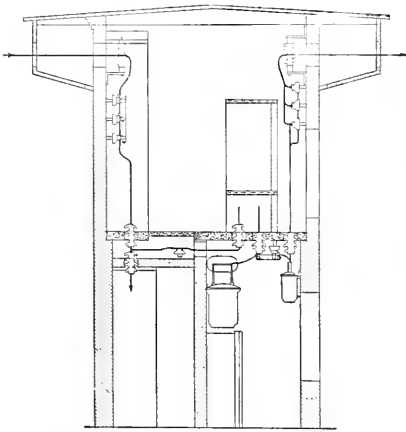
ELEVATION OF APPARATUS IN SCHENECTADY SWITCH HOUSE.
